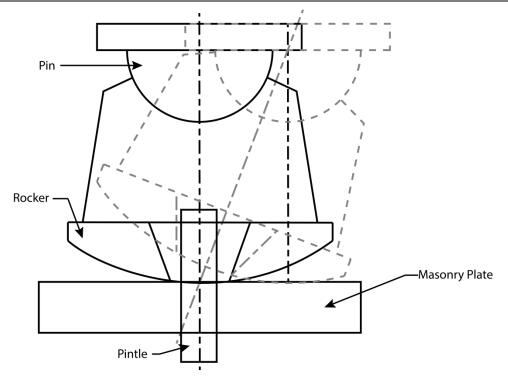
Schematic of Rocker Bearing Geometry Showing Pintle
